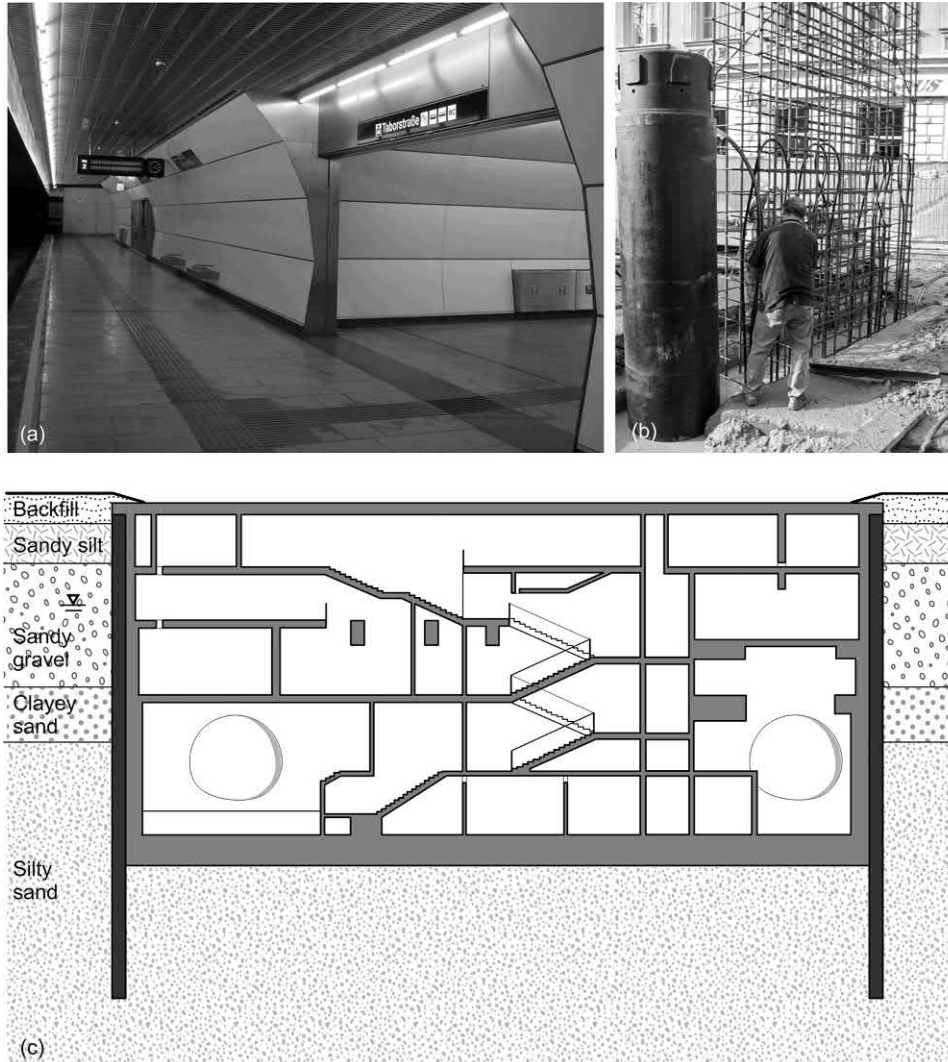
(A) Photograph of the Taborstraße energy station, (B) construction phase of an energy wall and (C) sketch of vertical cross section of the station. (A) *Courtesy IGT Geotechnik und Tunnelbau*, (B) *courtesy IGT Geotechnik und Tunnelbau*, (C) *redrawn after Brandl, H., 2006. Energy foundations and other thermo-active ground structures. Geotechnique 56(2), 81–122.
